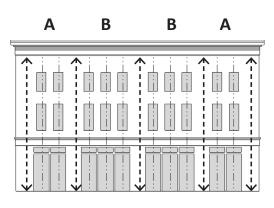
C.2: Structural and fenestration centerlines, showing how the solid and voids in the FAÇADE align vertically; and organization of the FAÇADE into vertical modules. The FAÇADE example here follows an ABBA pattern.
